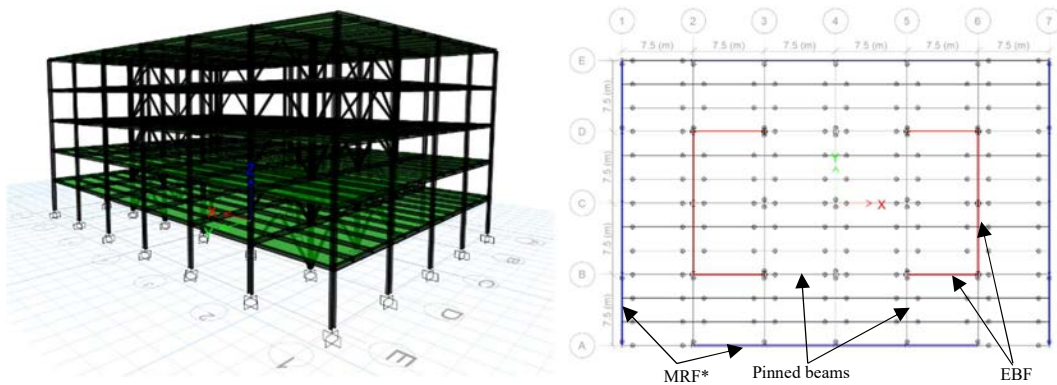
Geometry of the structural system, EBF: a) isometric view; b) plan view (\* MRF designed for gravity loads only)
